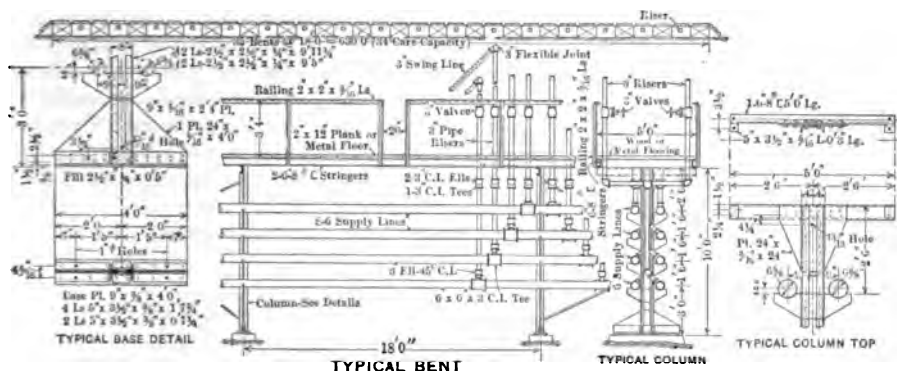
Side and sectional elevation loading rack, showing lines in position.
